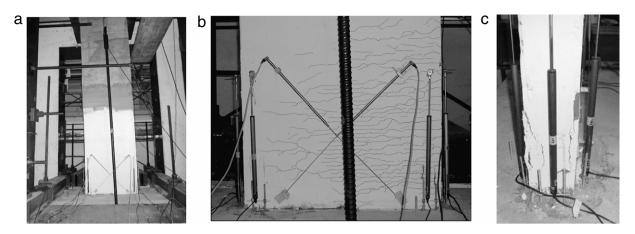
(a) Side view of the deformed shear wall at collapse; (b) detail of the crack pattern in the critical zone; (c) collapse induced by the crushing of the jacket.
